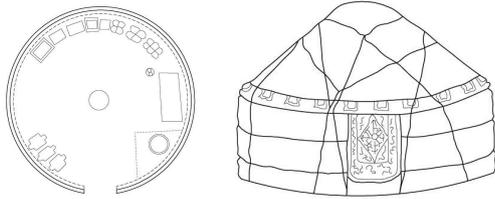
Plan and exterior elevation of Turkish Tent [23]
